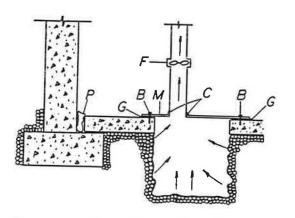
^0$ . Sub-slab ventilation using an opening cut through the slab and into the sub-slab gravel. This is simpler than the case of a sump in a sump opening but more than one opening may have to be made to ensure complete sub-slab ventilation without sub-slab drainpipes.
